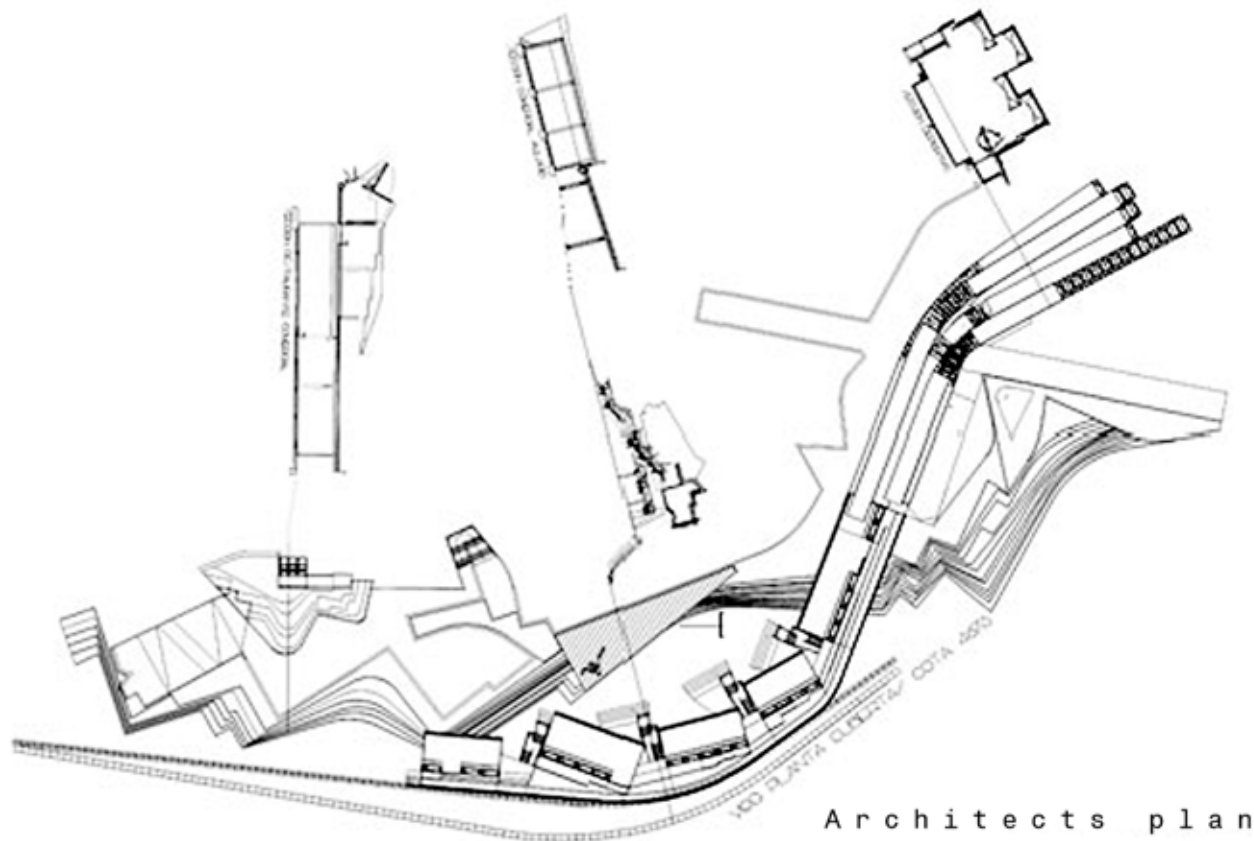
Plan and sections of intervention [Source: Architects' Website
